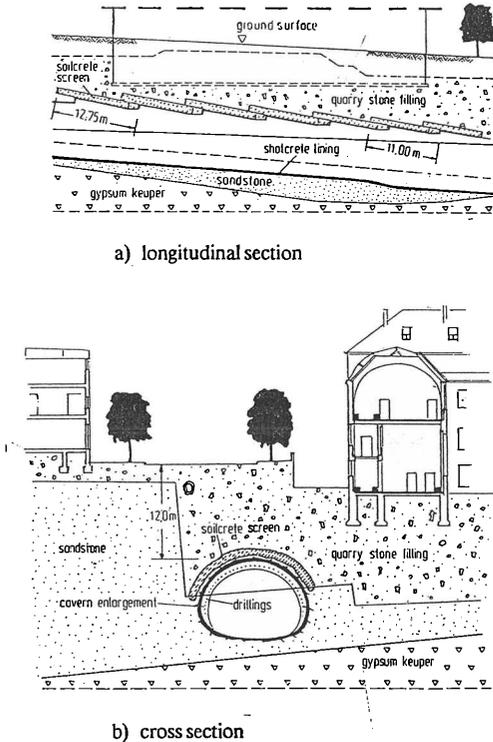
Expo tunnel, Stuttgart, tunneling with an advancing soilcrete screen, BEICHE et al. (1992)
